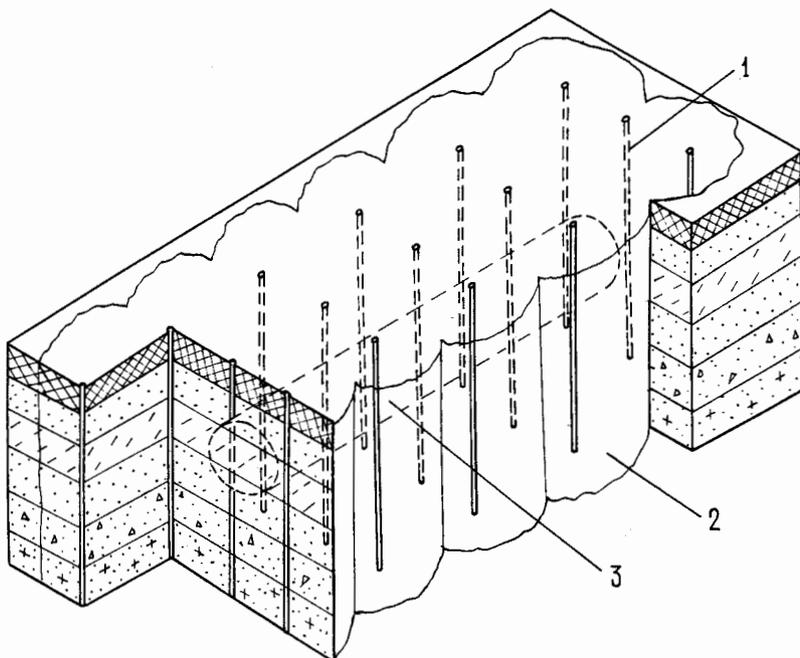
Schematic view for emplacing water sealing curtain around underground railway tunnel between stations 59-80 & 60-10
